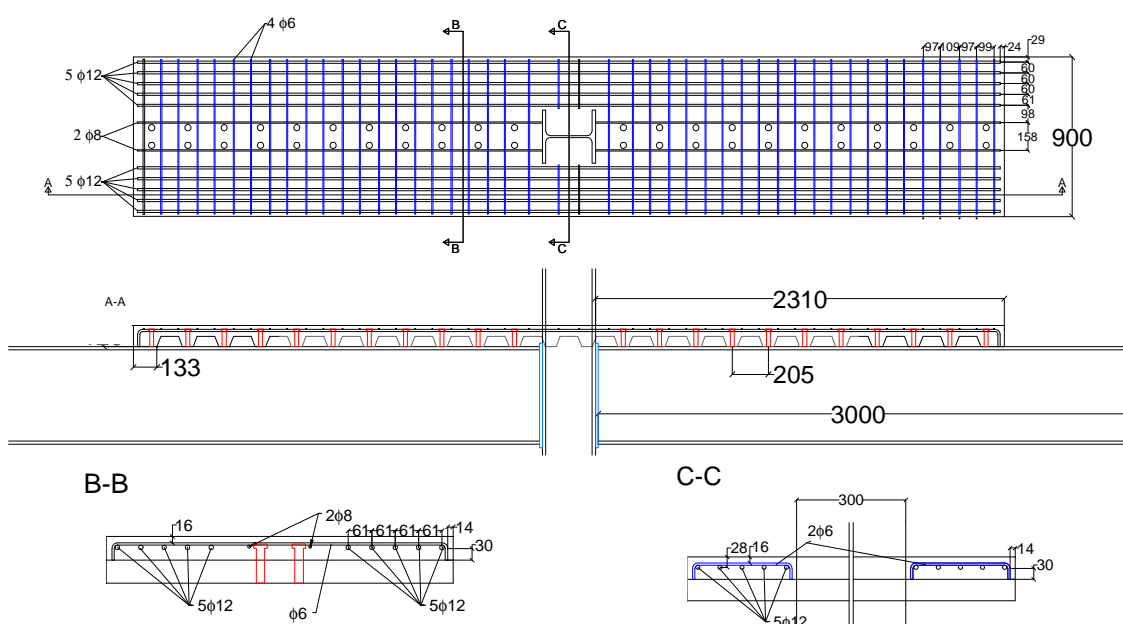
Details of the composite slab and longitudinal steel reinforcement
